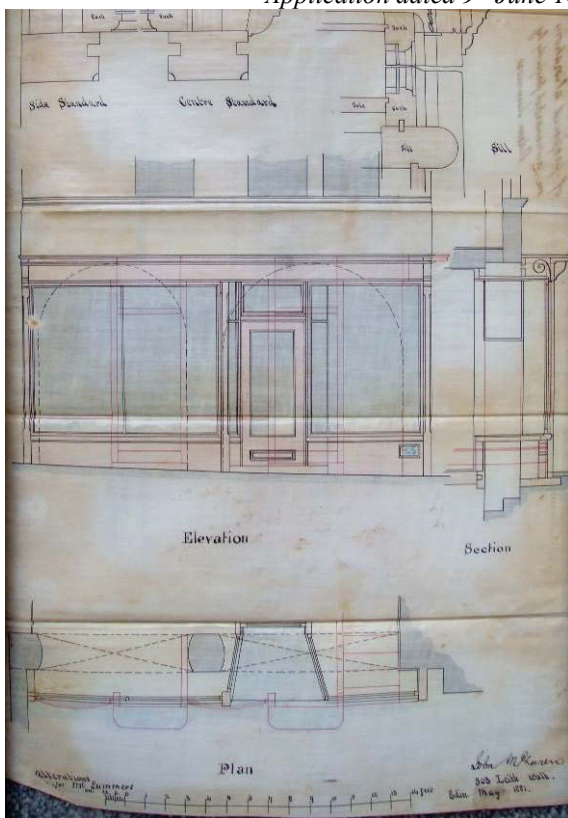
Drawings showing warranted alterations scheme for shopfront. Detail (mechanism fitting etc cropped out of view). Application dated 9th June 1881. City of Edinburgh plan store
